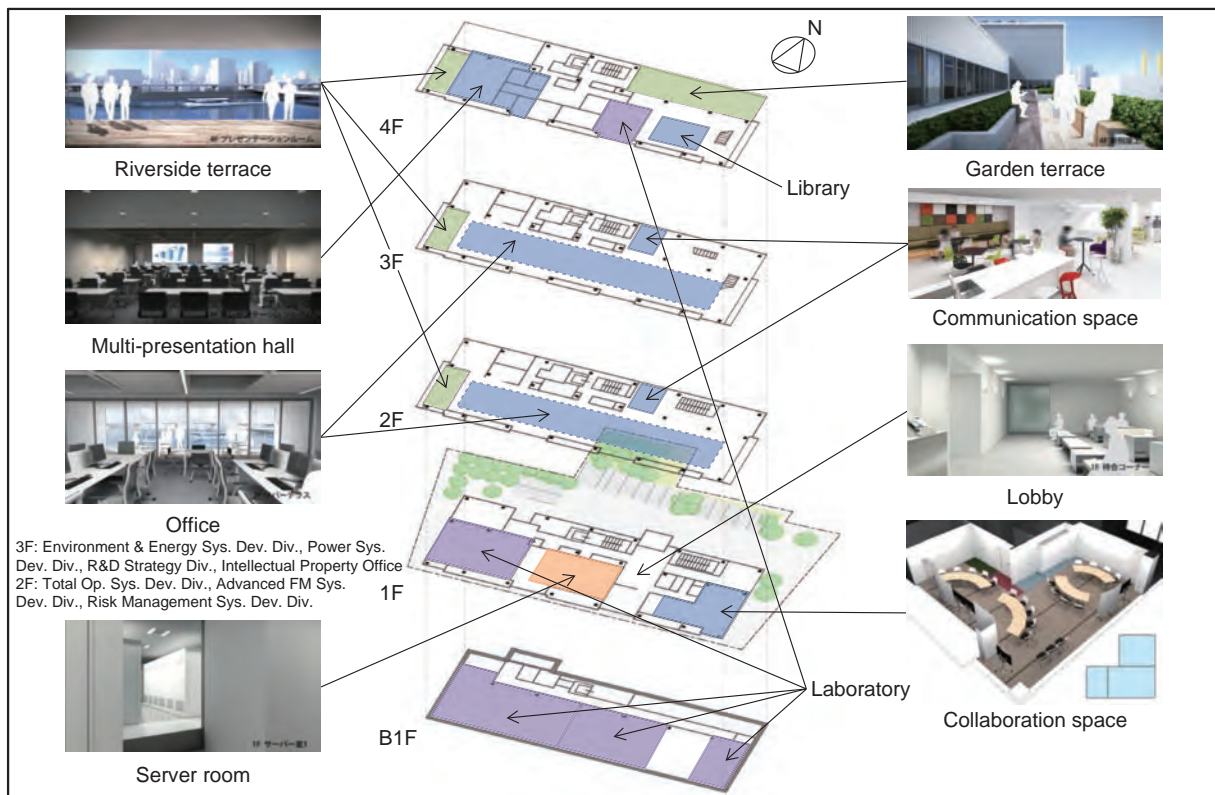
Floor map of NTT FACILITIES Shin-Ohashi Building.
